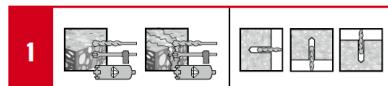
MANUFACTURER'S PRINTED INSTALLATION INSTRUCTIONS (MPII)
